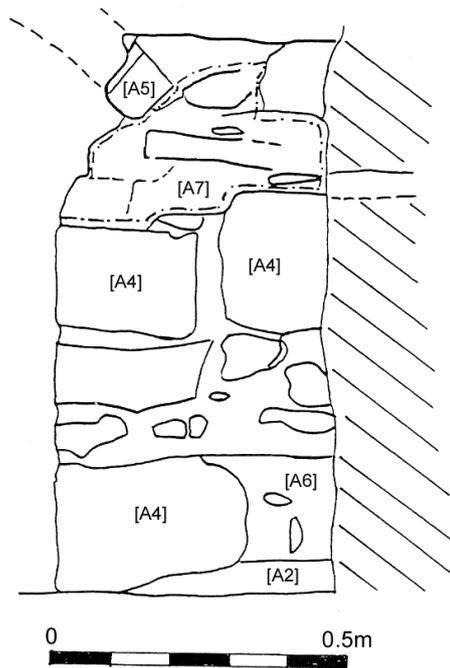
Section through the north wall of the culvert below the Honeywood shop. The section was created in 1990 when the north wall of the culvert was removed by contractors. Looking west.
